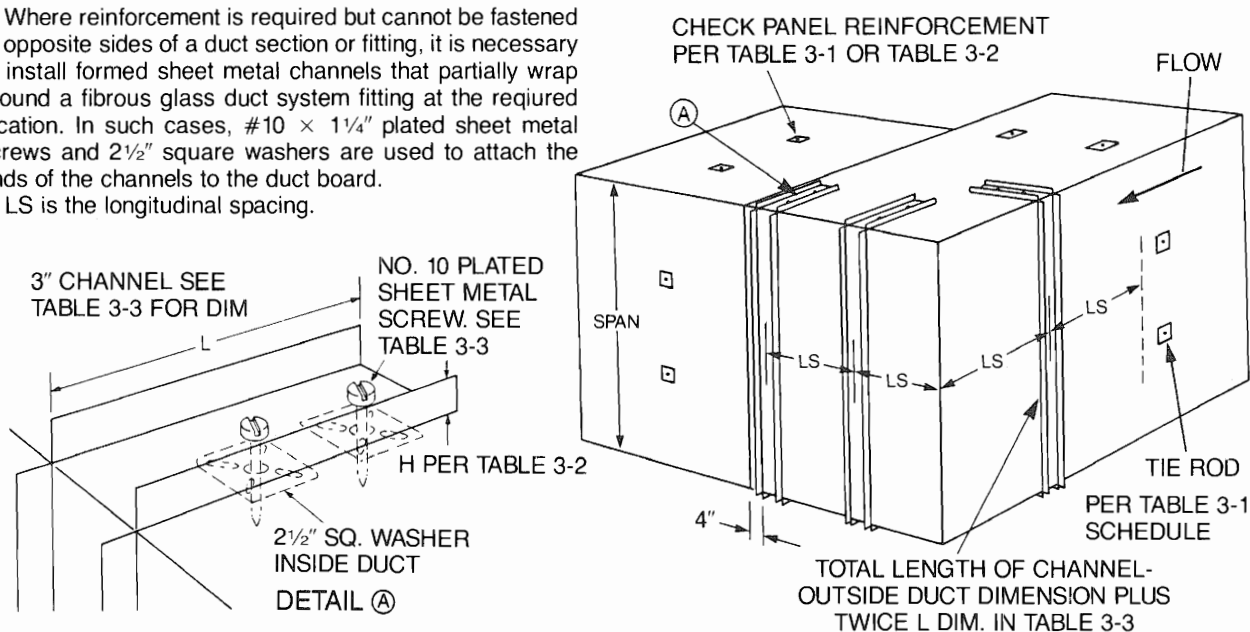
PARTIAL WRAP-AROUND REINFORCEMENT
